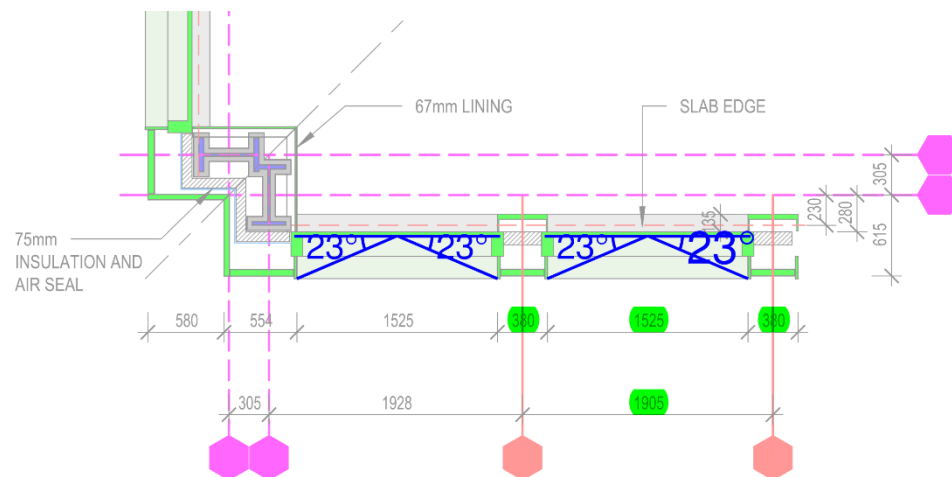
Architectural tower plan excerpt highlighting depth and spacing of window reveals compared with glazing line. Solar rays striking façade at greater than 23° to plane of glass will be obstructed by reveals.
